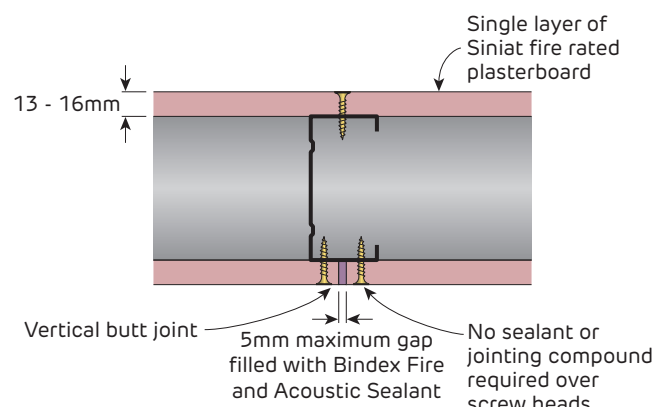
Vertical Joints in Single Layer Wall Systems
